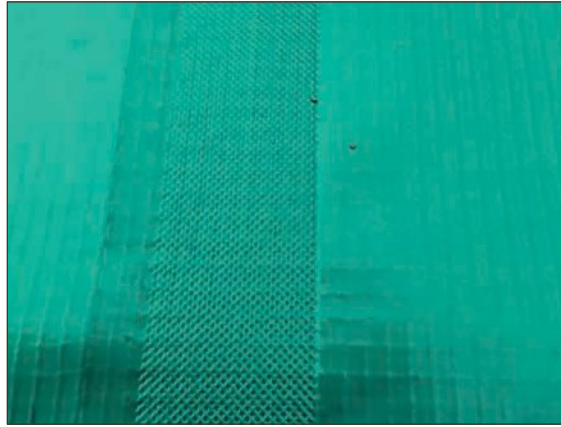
Wedge weld on an LDPE aluminium gas membrane, where the installer used metal nip rollers. This destroyed the top layer and probably the bottom layer, leaving aluminium exposed between the weaves. This failed dielectric testing along all joints (courtesy MEC Environmental Ltd)
